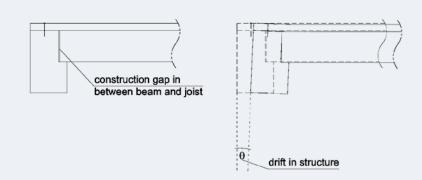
Construction gap between a timber floor and supporting beam to allow for rotation: a) undeformed state; b) deformed state.
